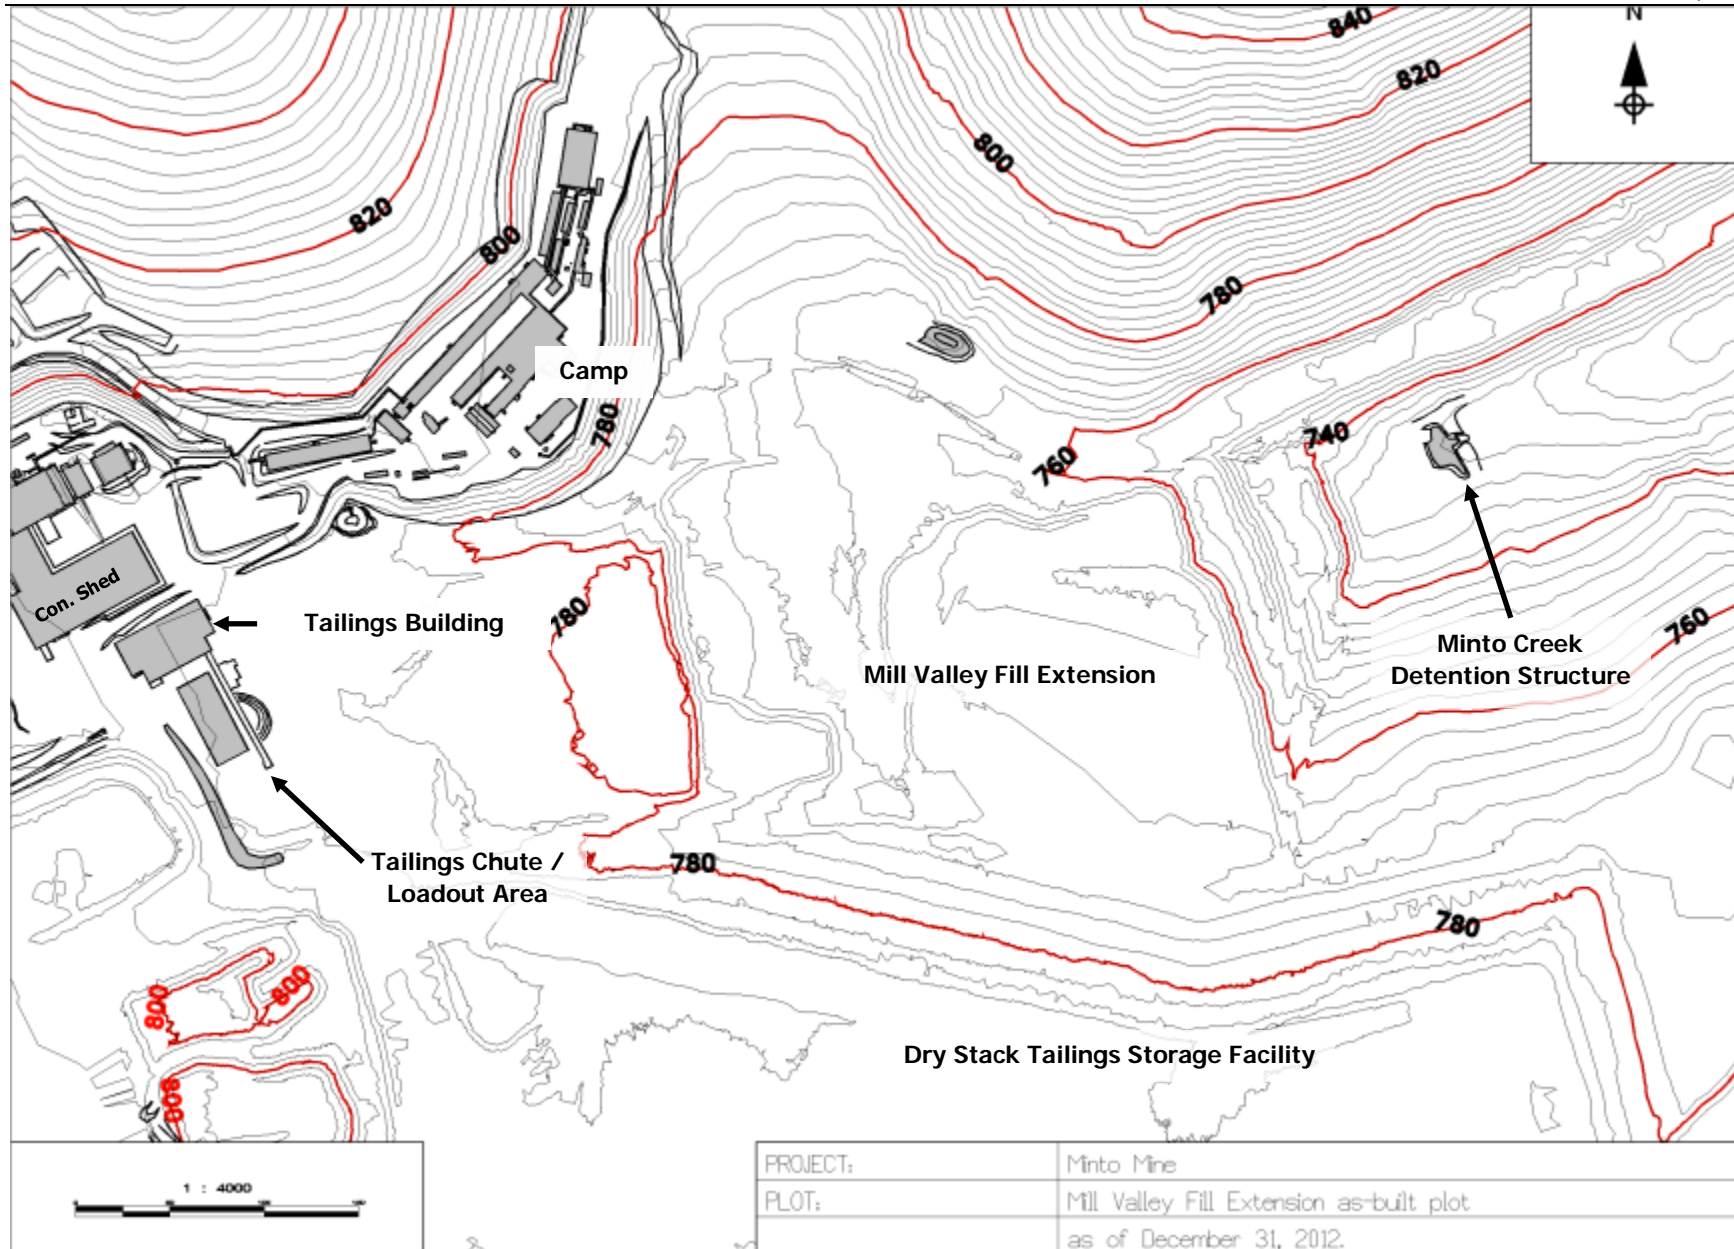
As-built drawing of the Mill Valley Fill Extension construction as of December 31, 2012.
